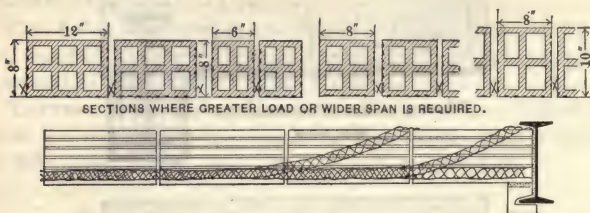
Half Section through Wide Span Arch, showing use of more than one piece of wire truss to give greater strength in centre and prevent shearing of blocks at ends of arch. Depth of blocks, number of trusses, and size of wires are proportioned to load and span.
